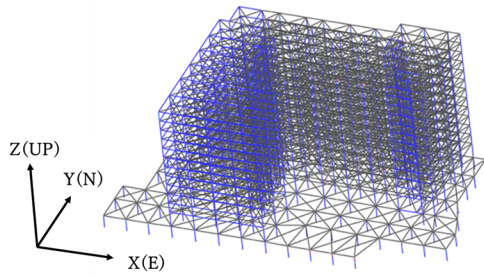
Finite element model of Champlain Towers South with 1 basement floor and 13 floors above ground.
